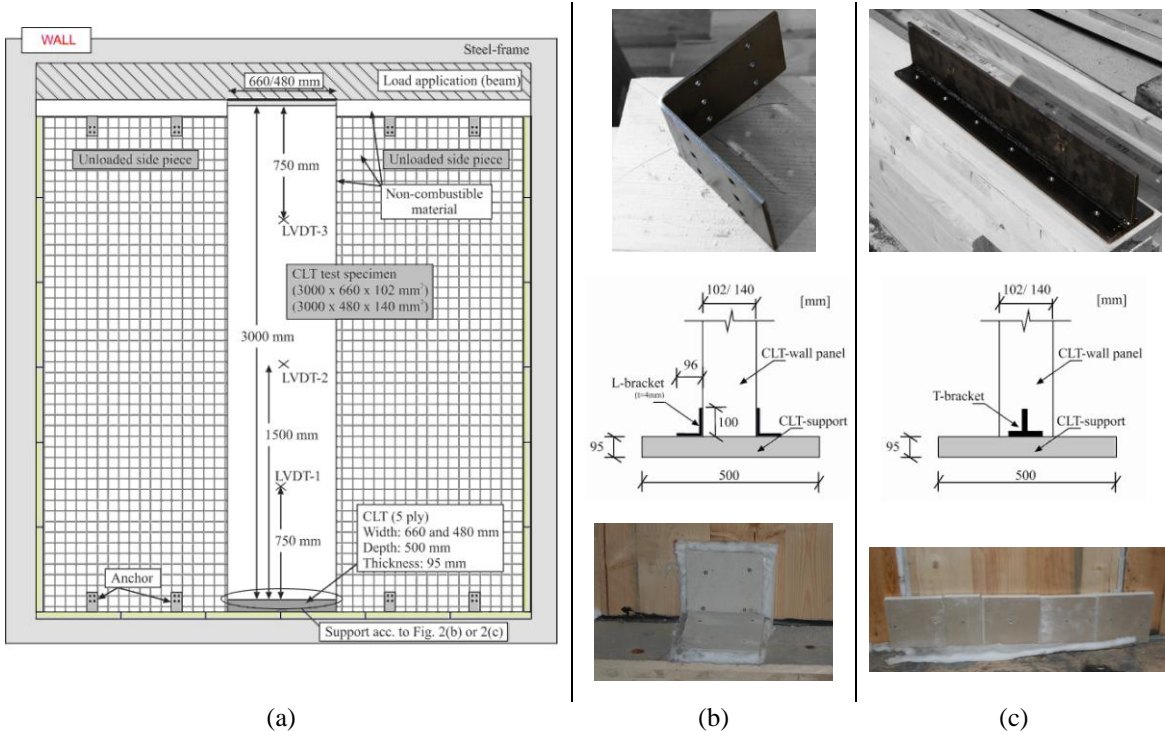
Test-setup for wall fire tests showing details of the weak and strong connection assembly. (a) Wall test setup. (b) L-brackets (weak connection). (c) T-bracket (strong connection).
